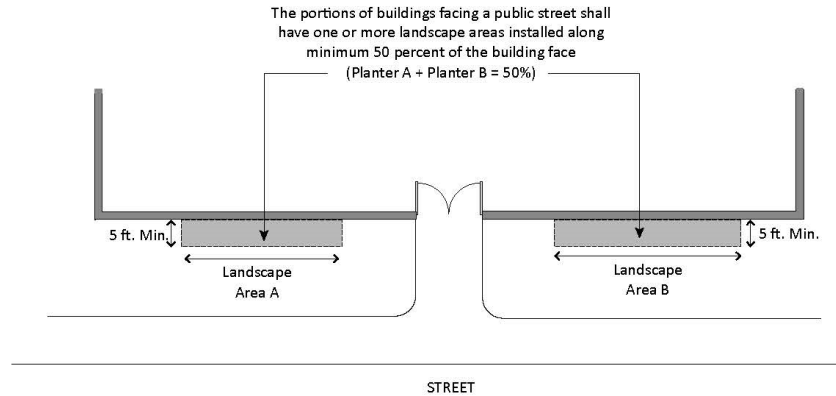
N1.D: BUILDING PERIMETER LANDSCAPING
